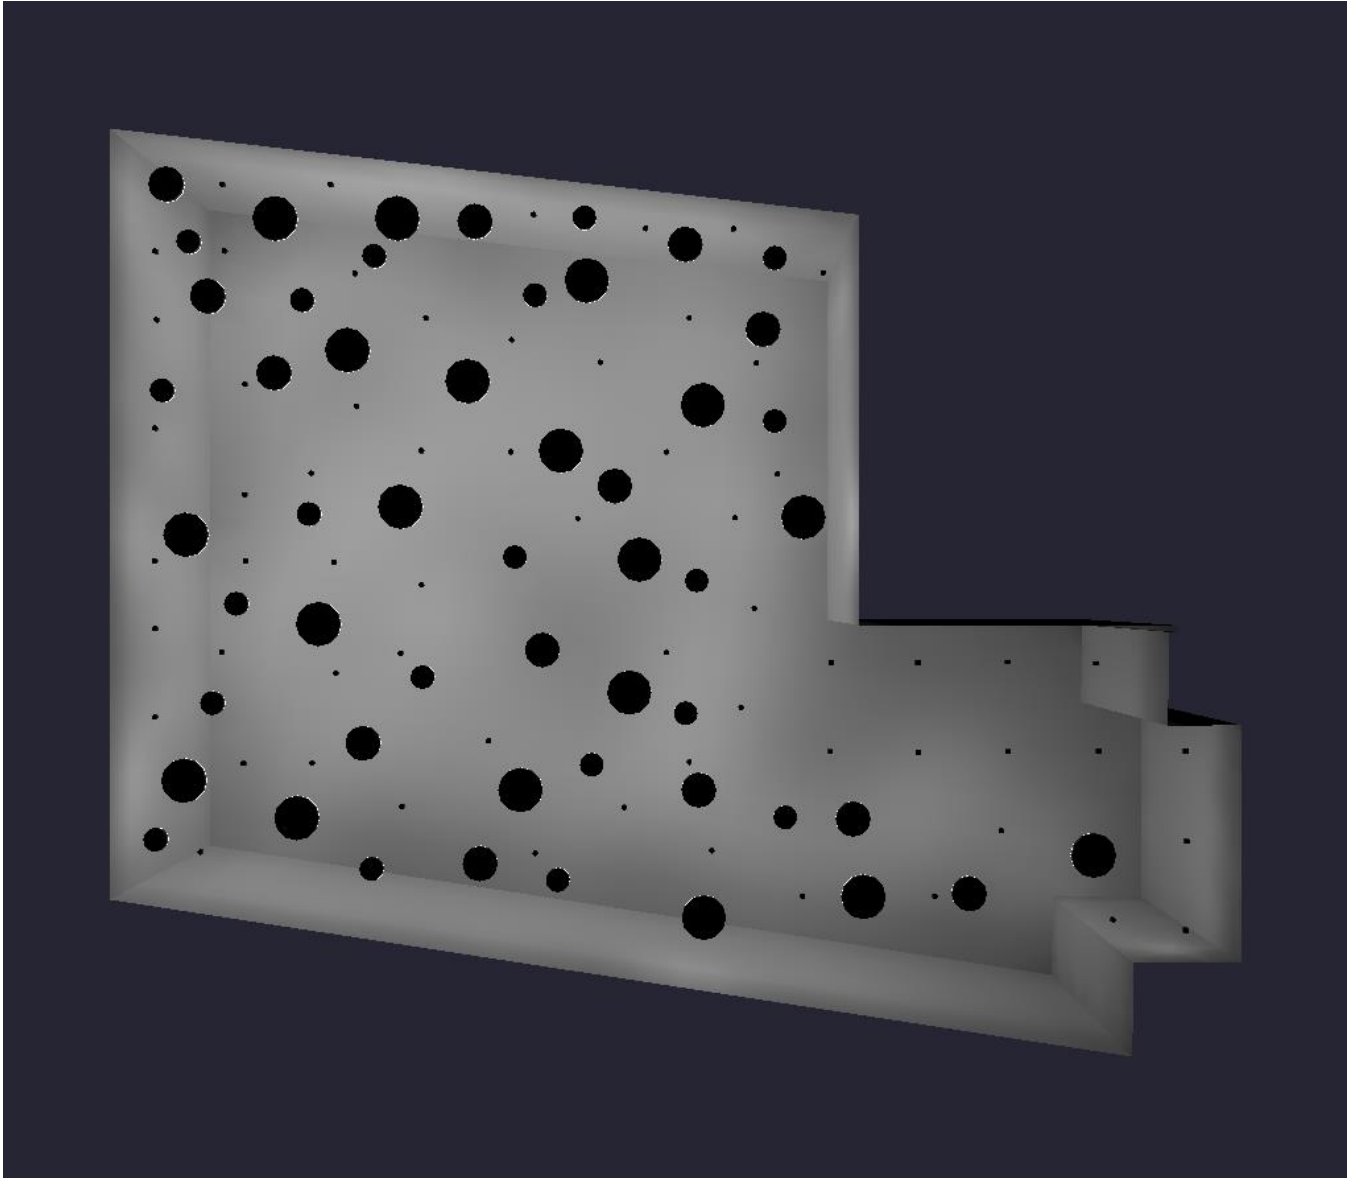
Ceiling Plan of Existing Lighting in AGi32
